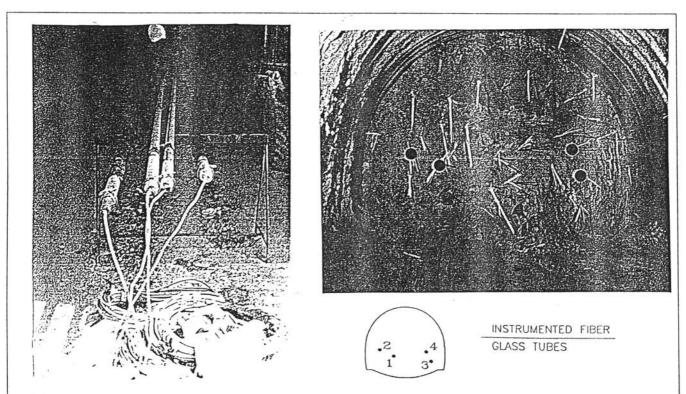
Instrumented tubes ready to be installed and location of instrumented fiberglass tubes.
